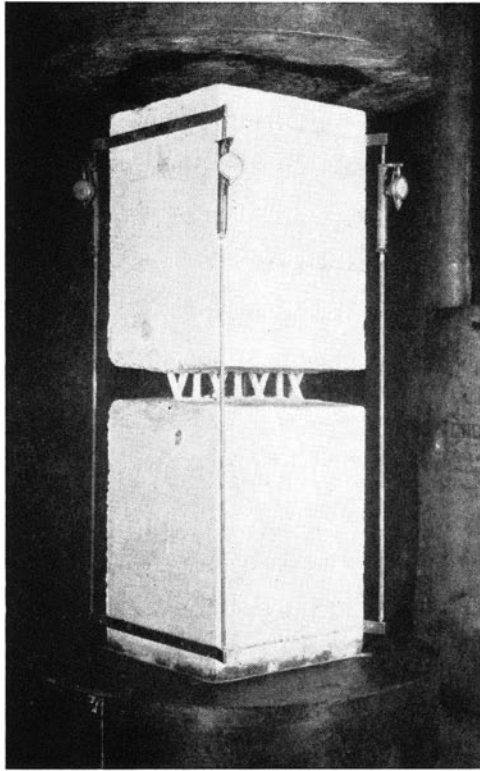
VERTICAL LOAD SPECIMEN IN TESTING MACHINE
